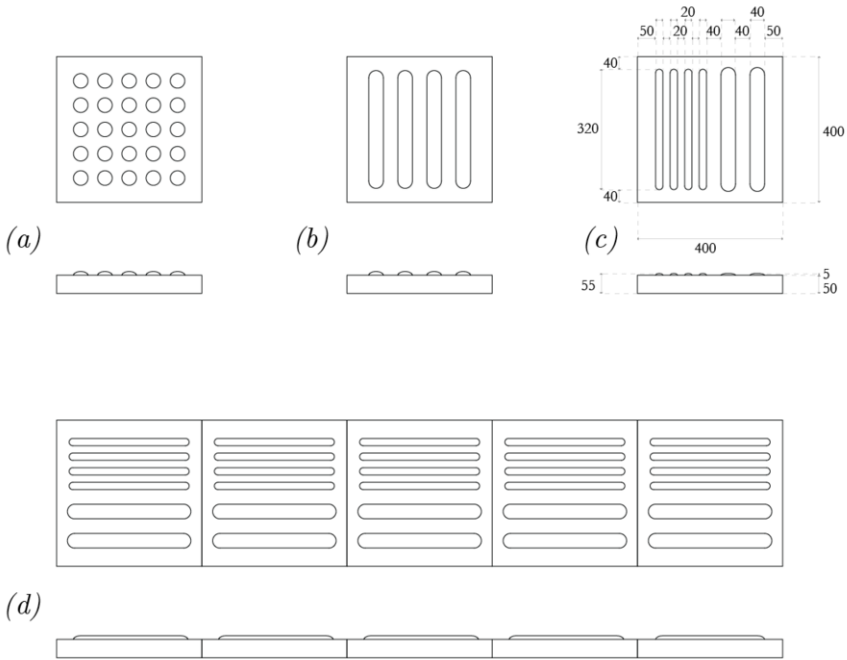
(a) Warning blocks with 25 small domes; top view and elevation. (b) Directional blocks with four long bars; top view and elevation. (c) Asymmetrical blocks with two standard long bars on the right side and four narrow long bars on the left side; top view and elevation. (d) An assembly of five unidirectional blocks; top view and elevation. Dimensions in millimeters.
